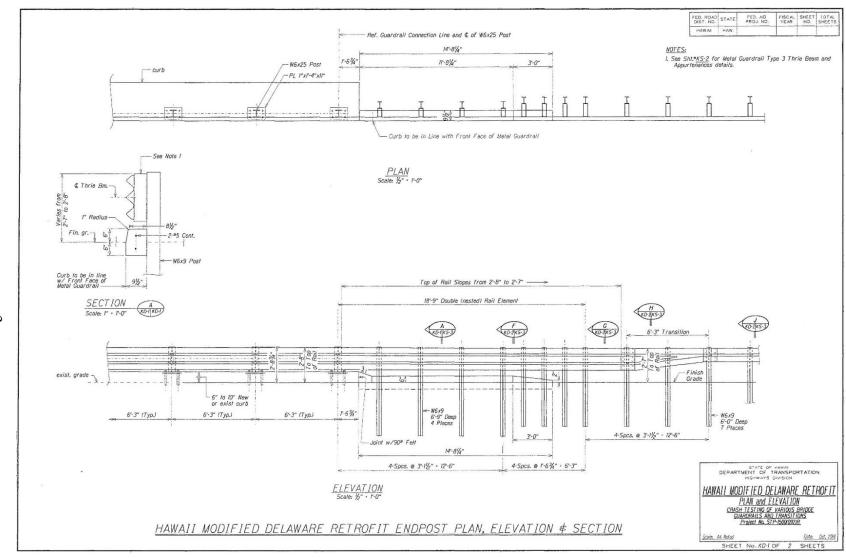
Original HDOT AGT Transition to Hawaii Modified Delaware Thrie-Beam Bridge Rail Details
